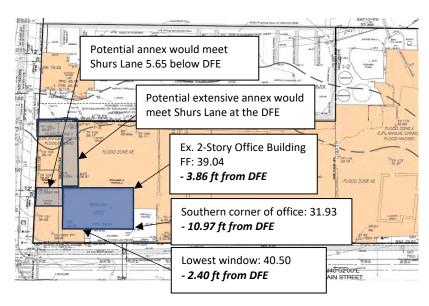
Scenario 2: Renovation of existing office building for commercial use.
